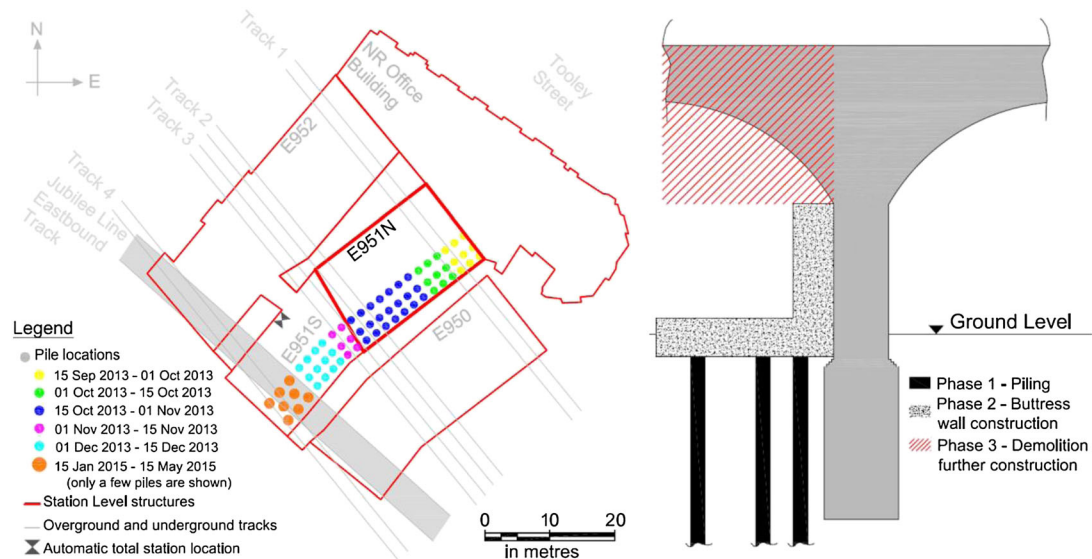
Plan view (left) and cross-sectional view (right) of the monitored arch E951N illustrating the associated construction works.
